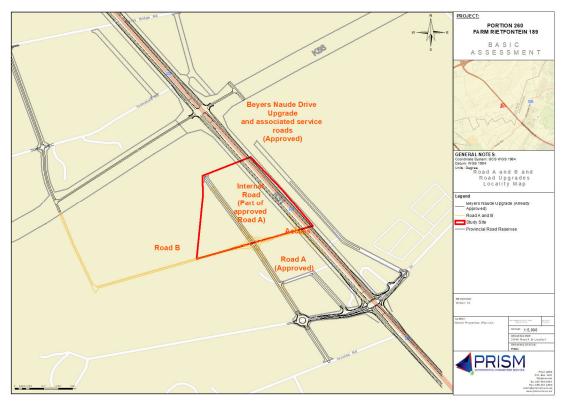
Roads and Approved Beyers Naude Upgrade – Alternative Layout
